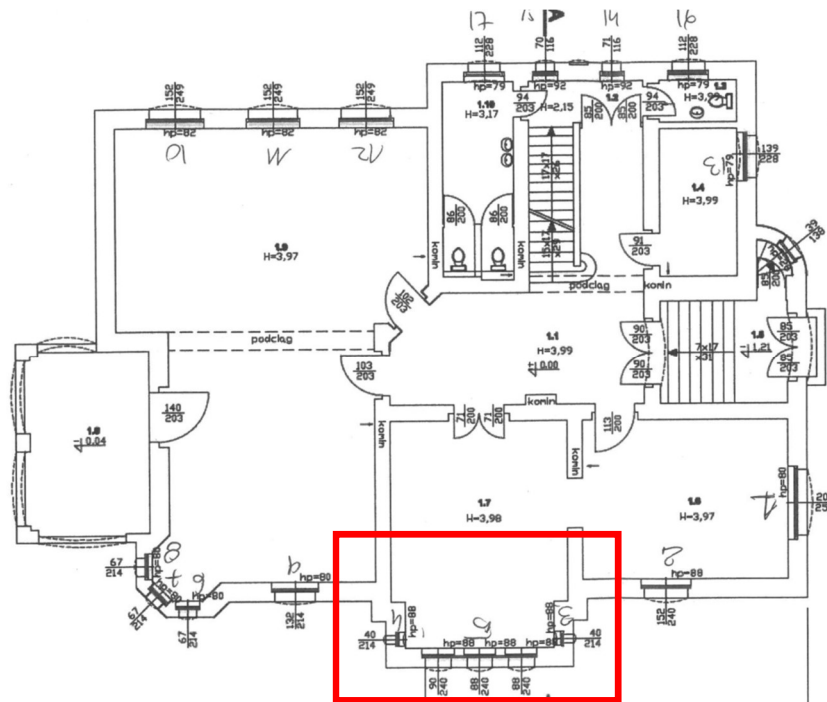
Polish Museum - Ground floor of the building with indicated proposed windows area to be renovated
